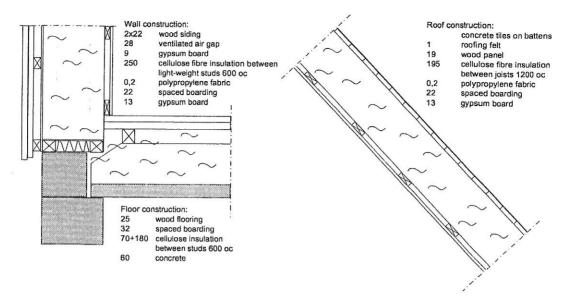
Roof, wall and floor constructions in the houses (measures in mm).
